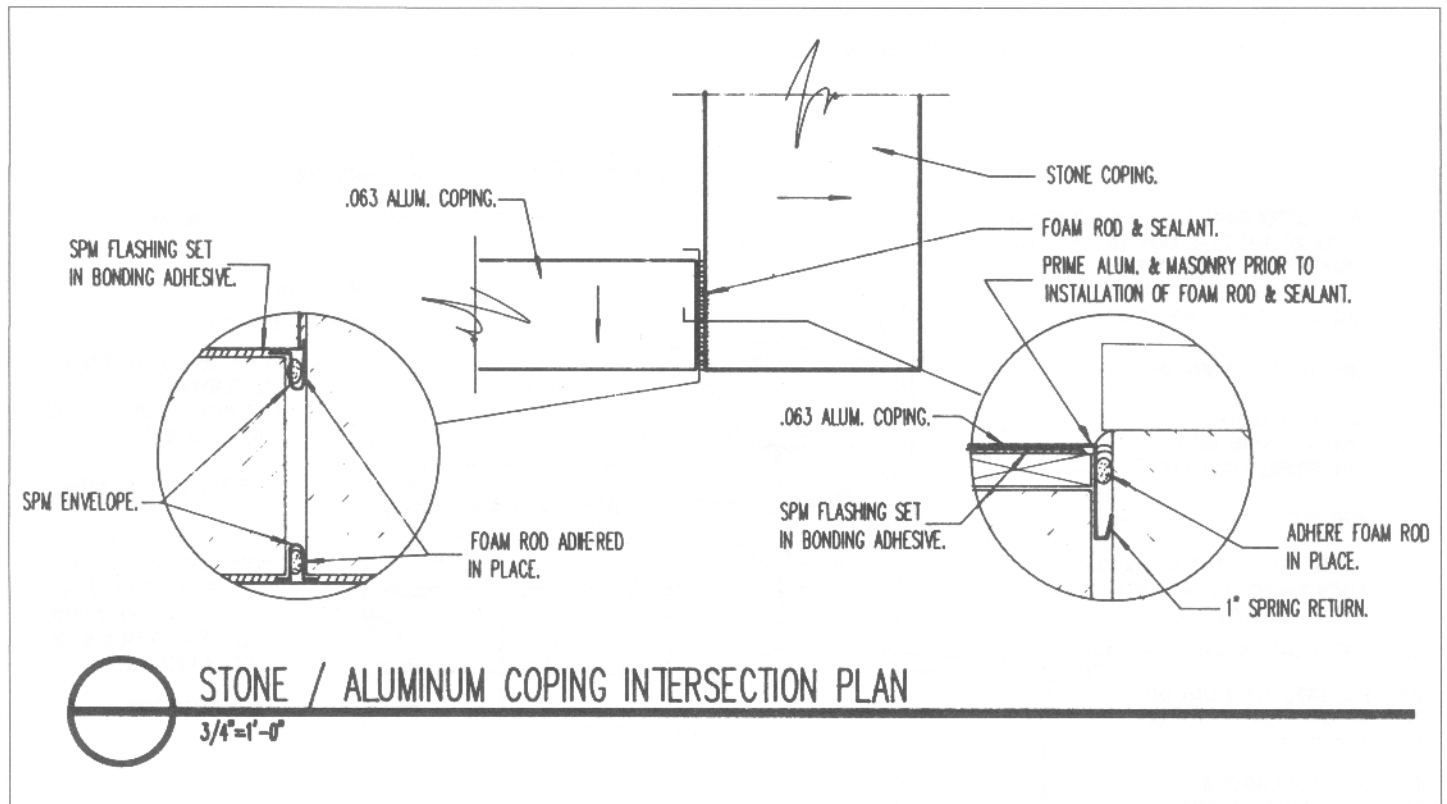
All detail conditions encompassing the roof should be addressed and whatever detail information required to communicate same should be presented.
